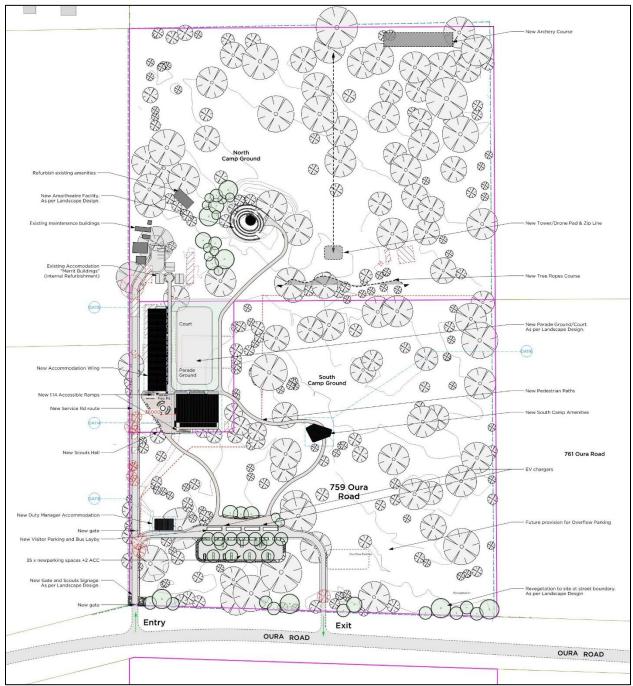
Proposed Site Plan (Source: PDML, 2023)
